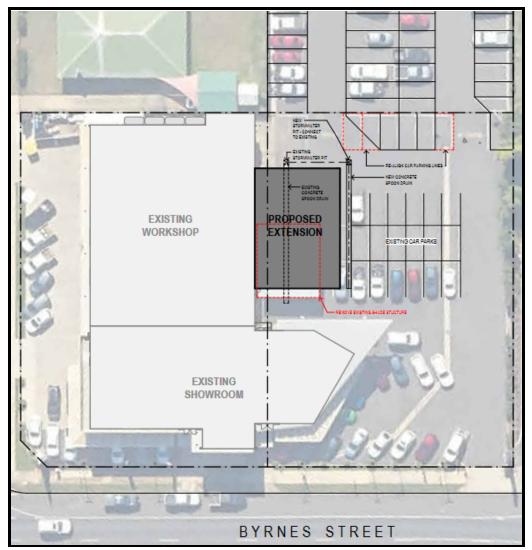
Extract from Development Plans (Prepared by U&i Town Plan, © State of Queensland (Department of Resources) 2022)
